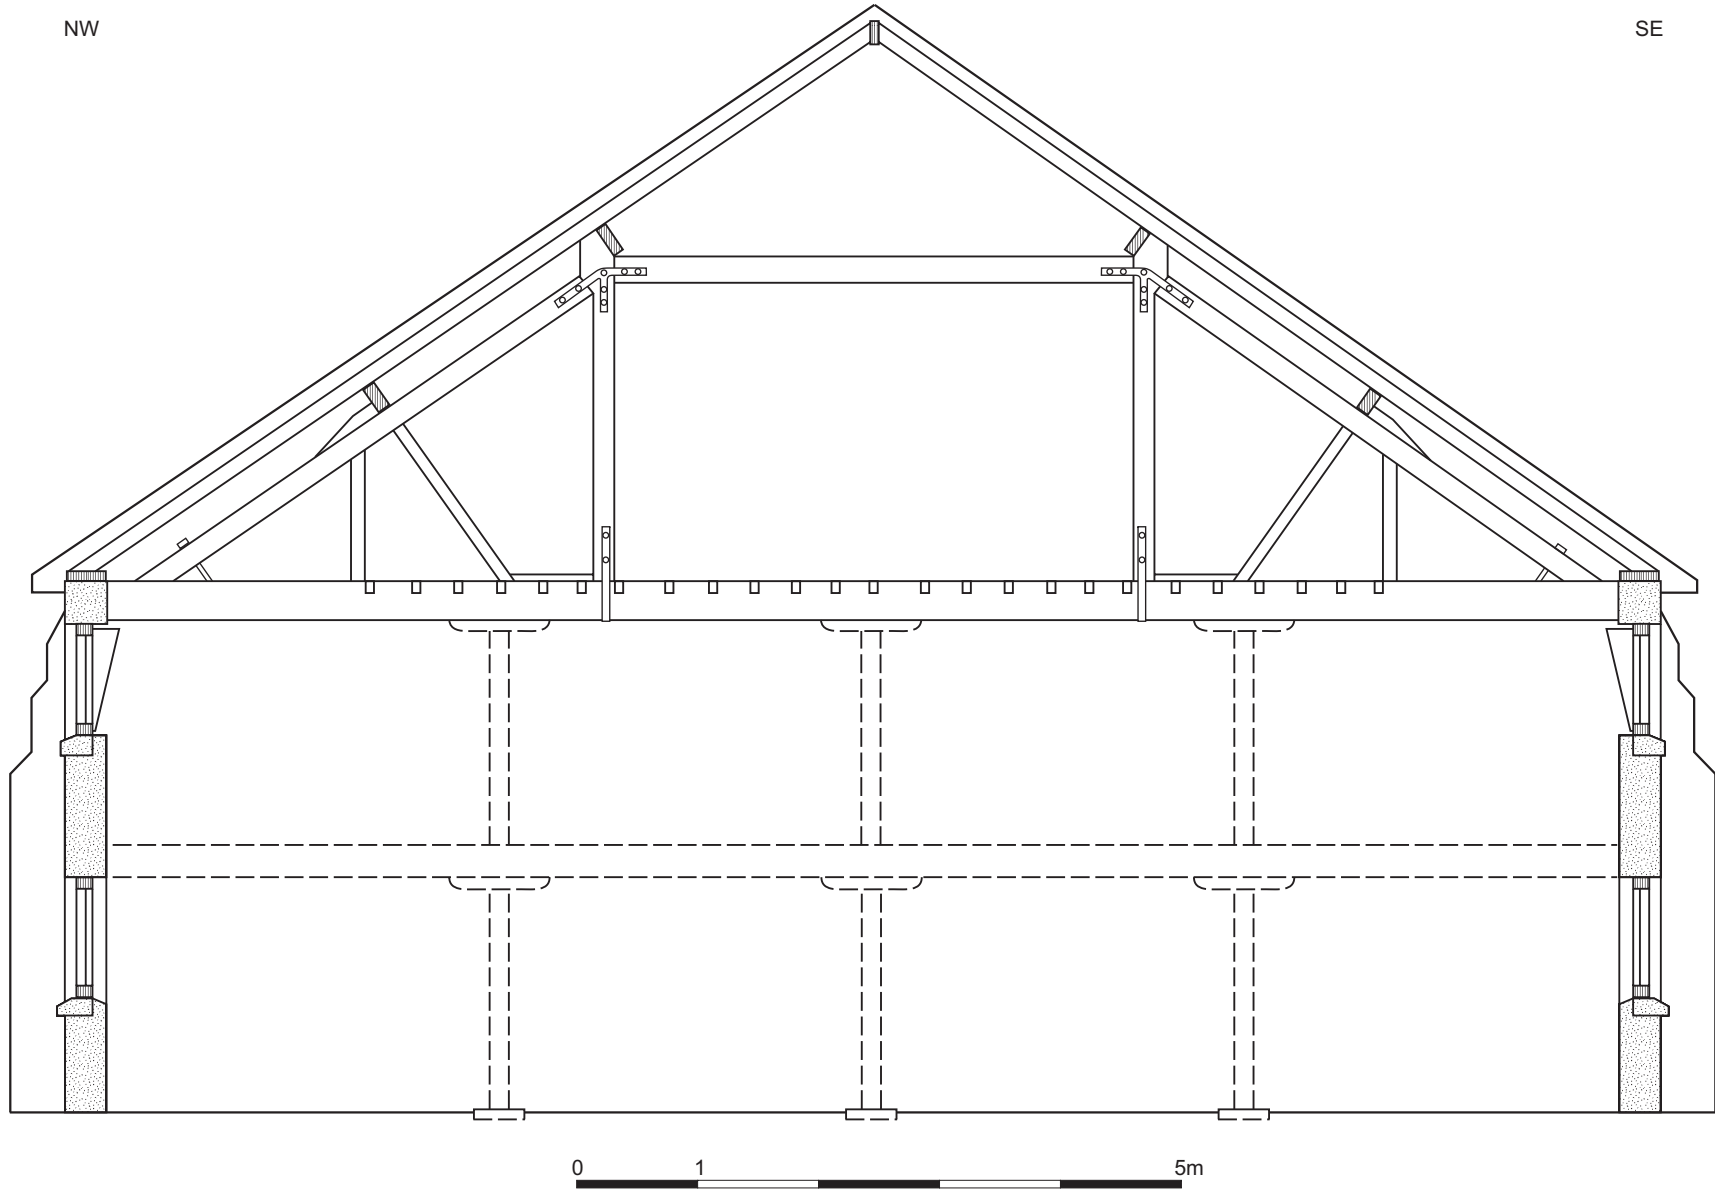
Cross section of malthouse with positions of removed floor and posts marked. Scale 1:40
